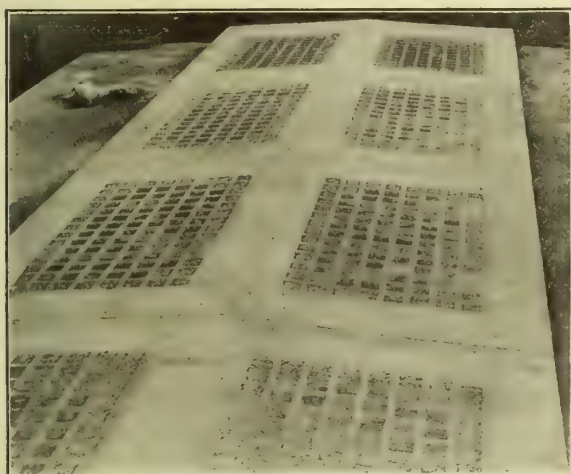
"BRUNER" SKYLIGHT CONSTRUCTION
